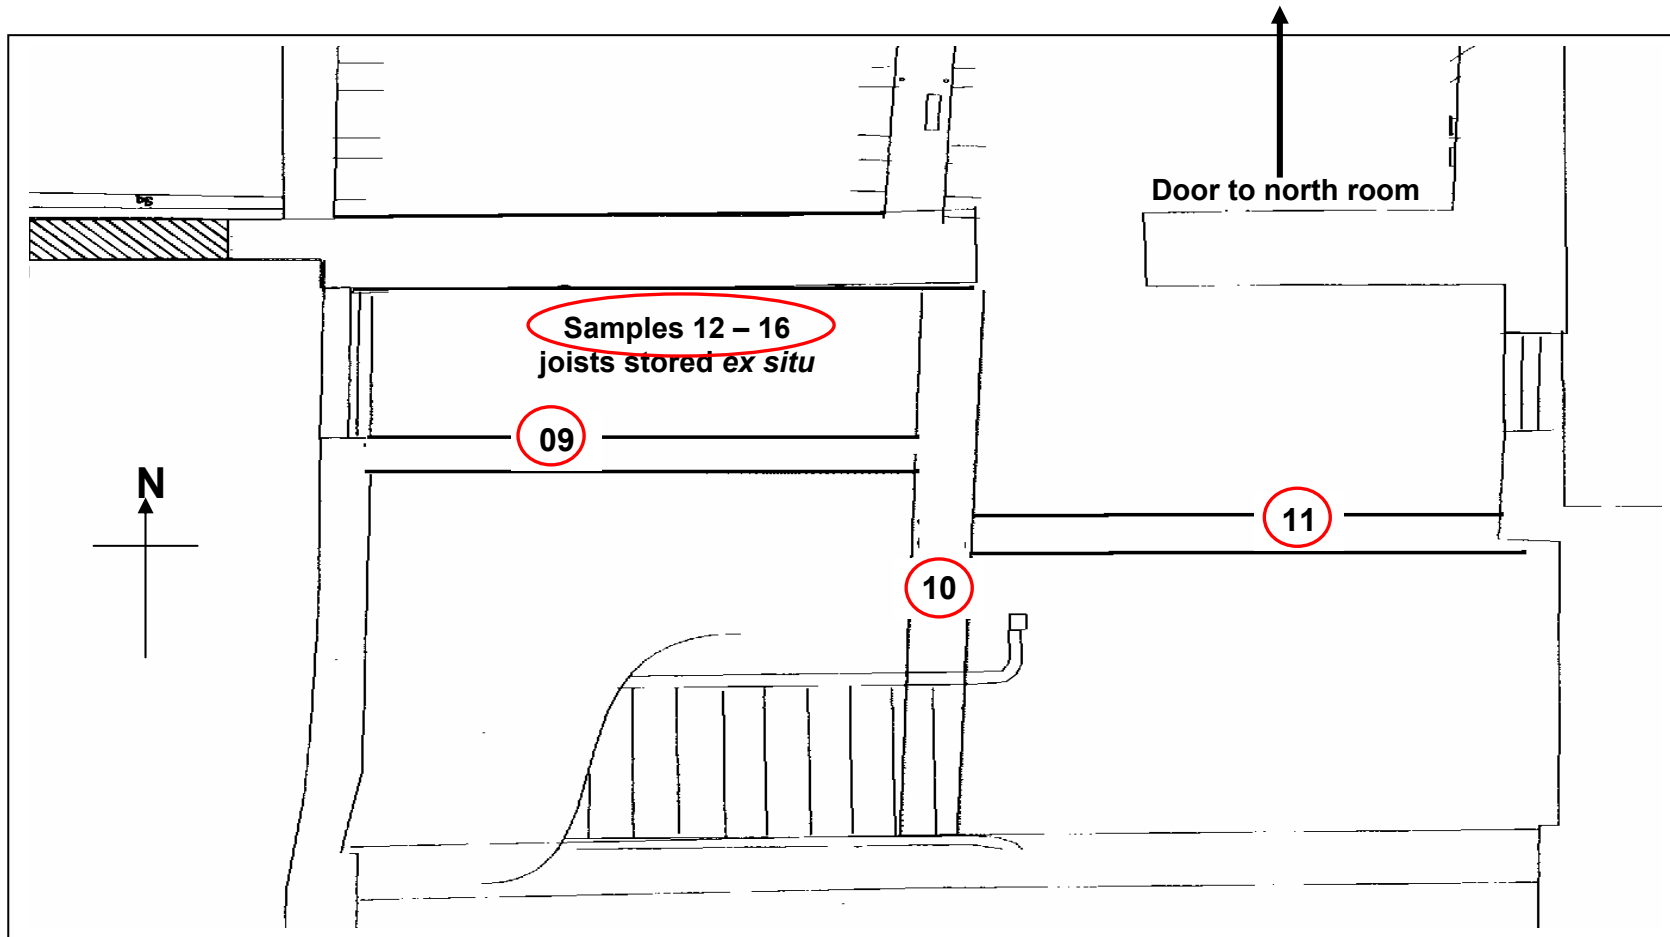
Plan to show location of samples from the stairs timbers and removed joists (after Mike Napthan)
